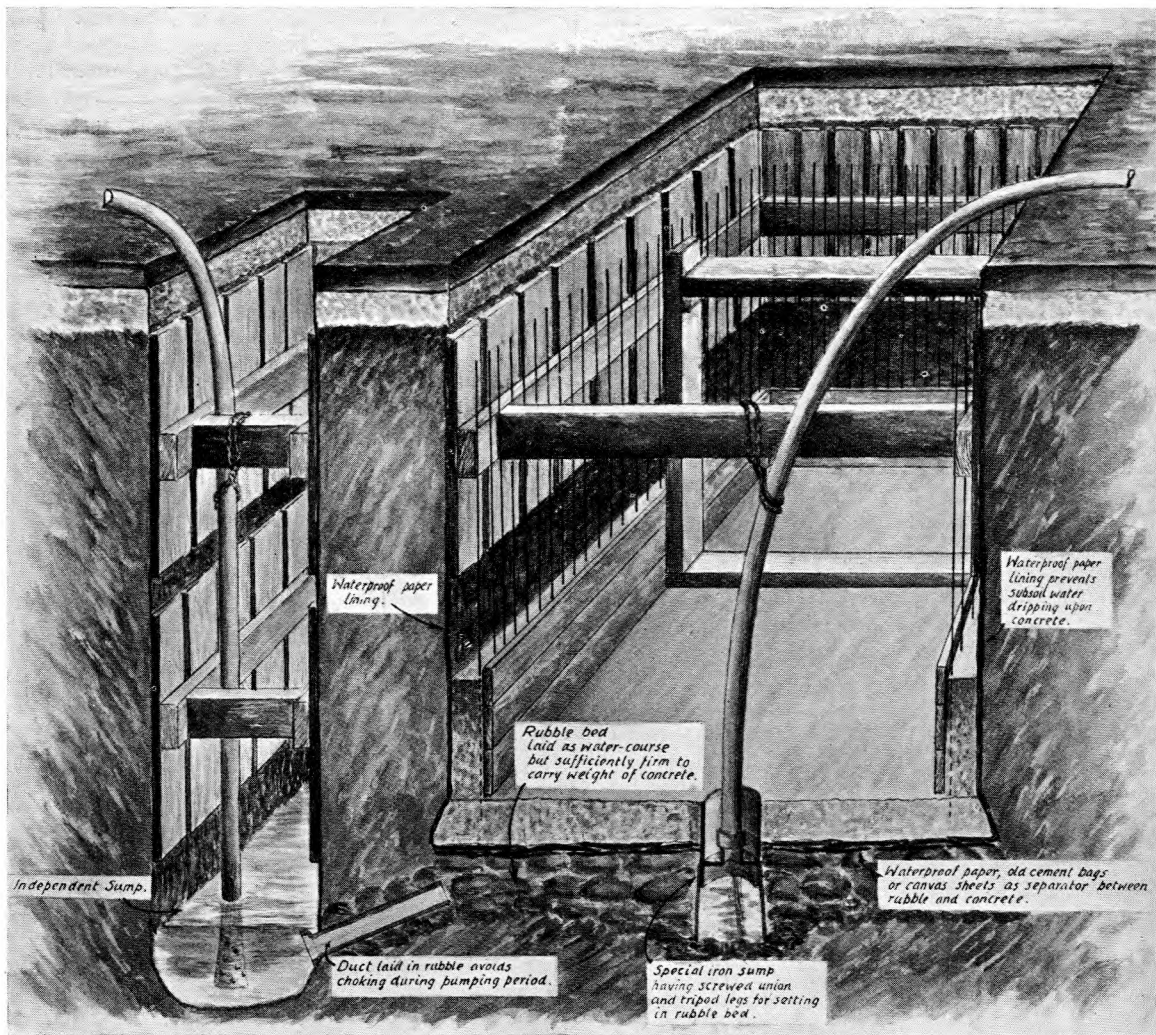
BUILDING A MANHOLE IN A WATERLOGGED SITUATION.
